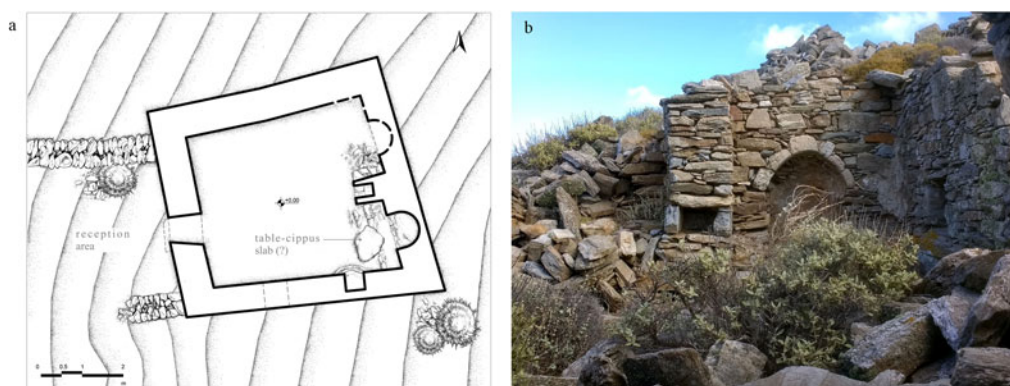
Ch 15 (a) floor plan (b) the interior looking east, apses separated by small wall section bearing a niche.
